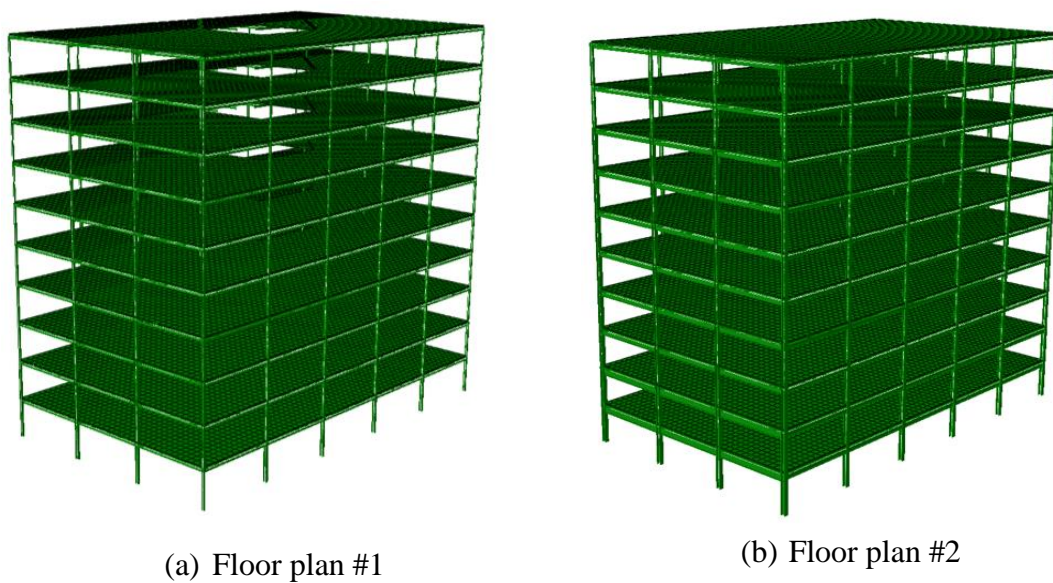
Isometric view of the structural analysis models with rendering of beam and shell elements: (a) floor plan #1; and (b) floor plan #2.
